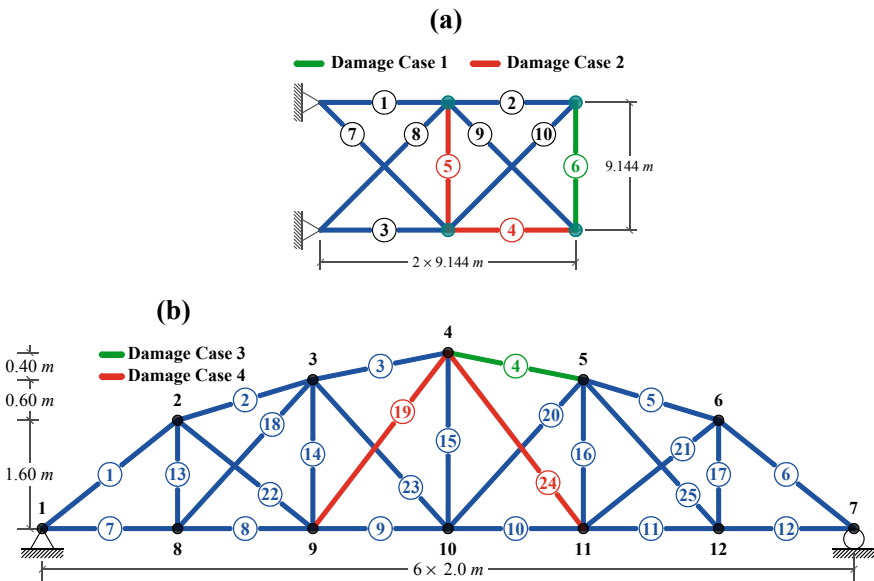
FE model of planner truss: a a 10-bar plane truss and b a 25-bar plane truss
